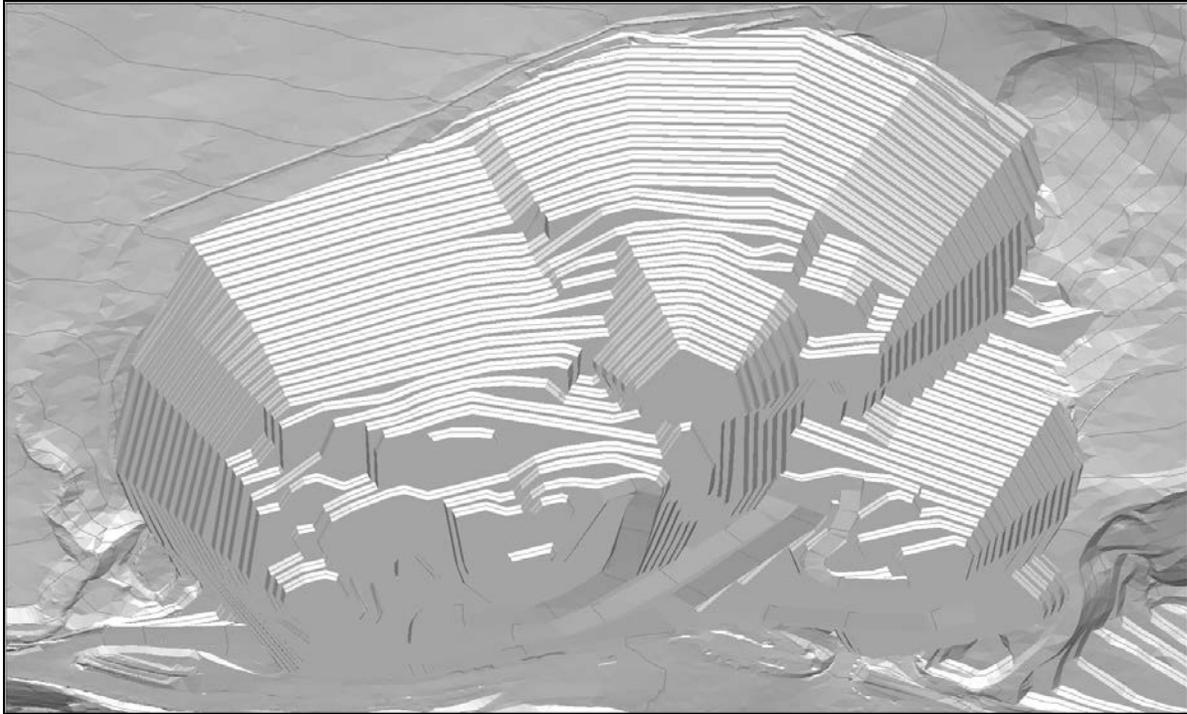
Final Aqqaluk Pit Configuration looking North, isometric view.
